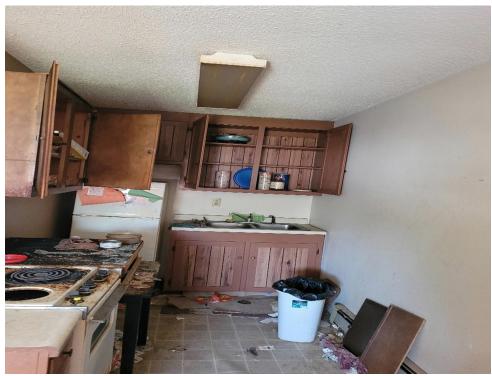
View of positive vinyl sheet flooring 2 layers in building 211 2nd floor south end apartment kitchen.
